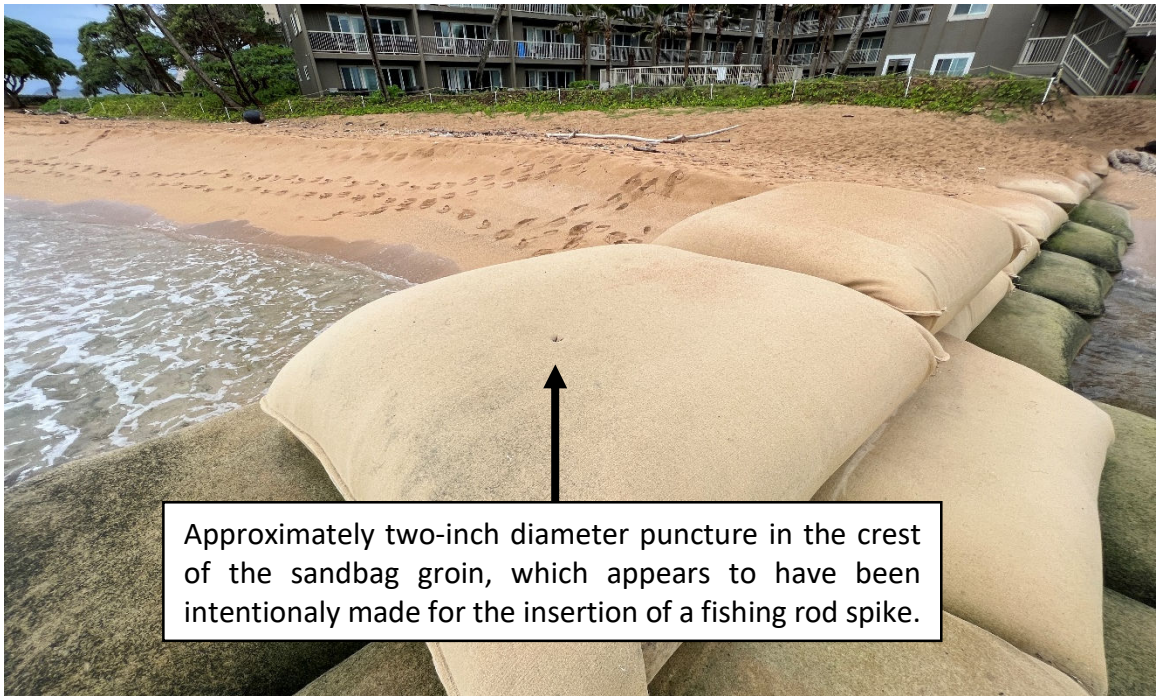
Photograph taken on November 30, 2023, showing minor damage that was observed to one of the groin's geotextile containers
